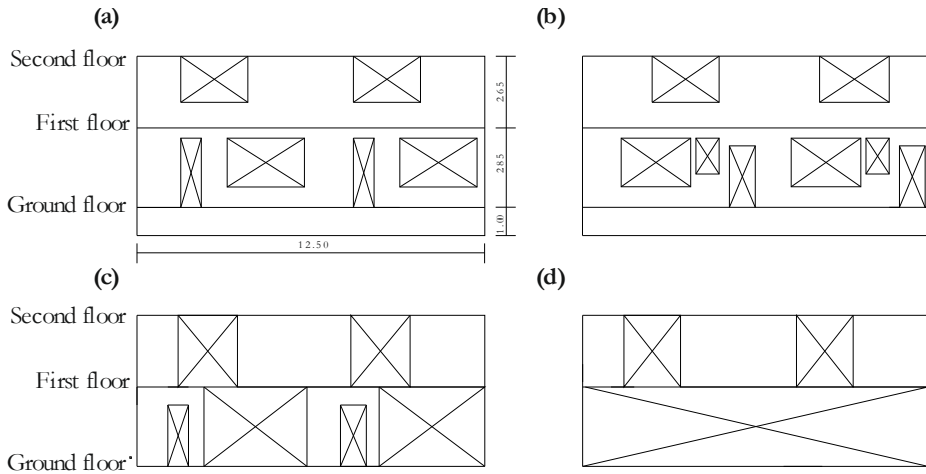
Geometry of the walls disposed along the X-direction: frontal wall (a), back wall (b) and internal walls (c-d).
